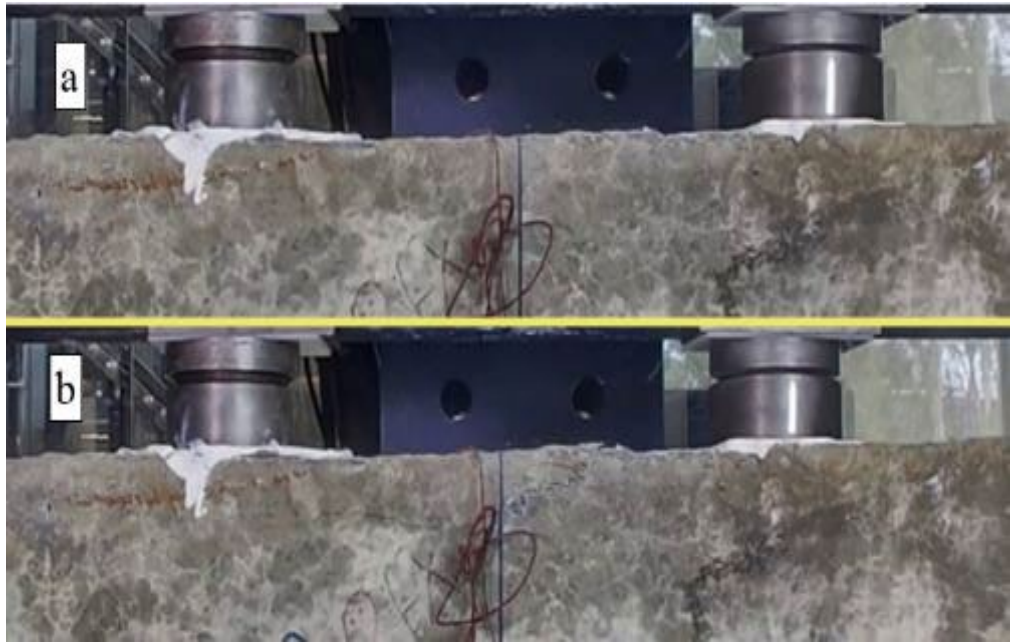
Prestressed beam (a) before failure (b) after flexural compression failure.
